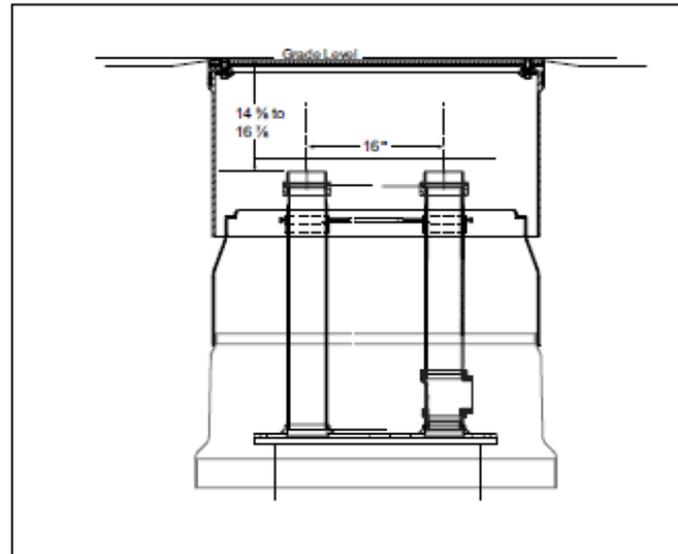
Installation Using M/F 4x4 Riser Adapters NPSM (Straight Thread) Buckets
